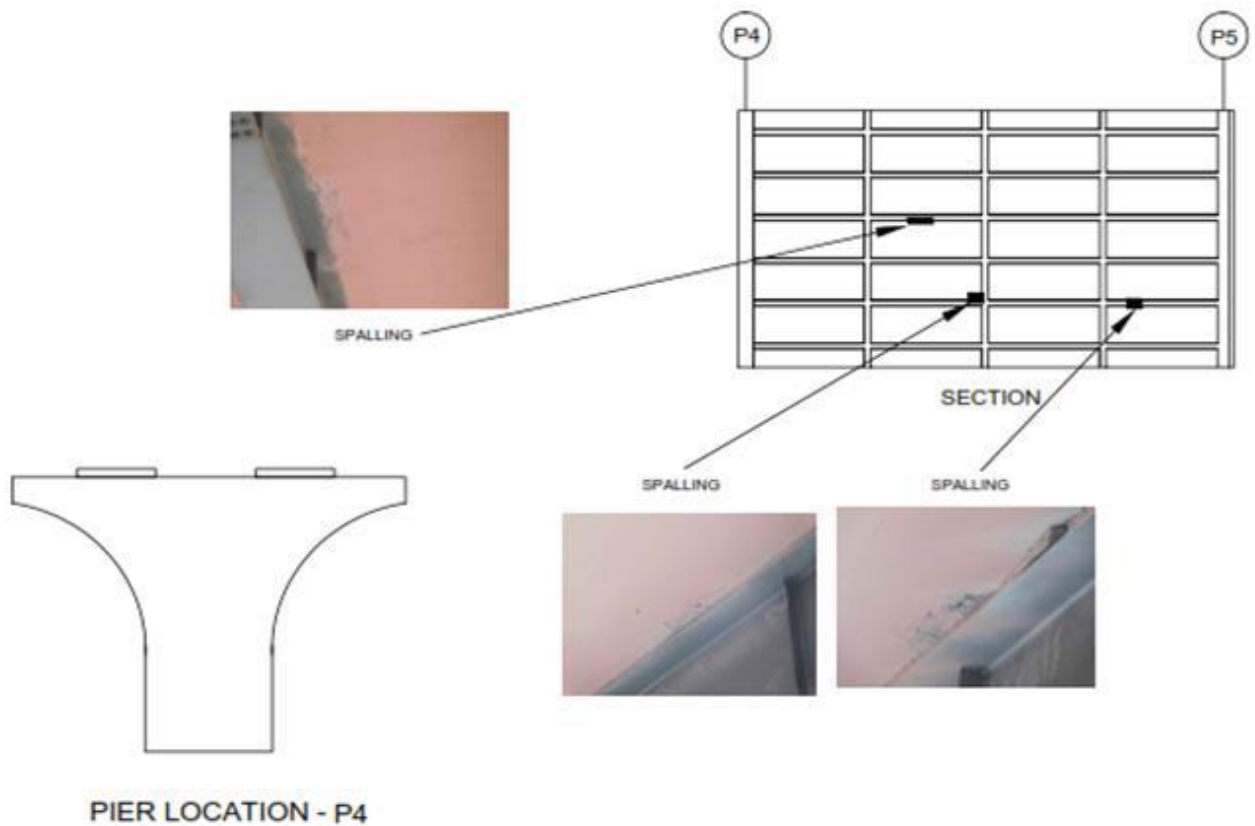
Spalling of concrete near the junction of girder and panels between P4-P5
